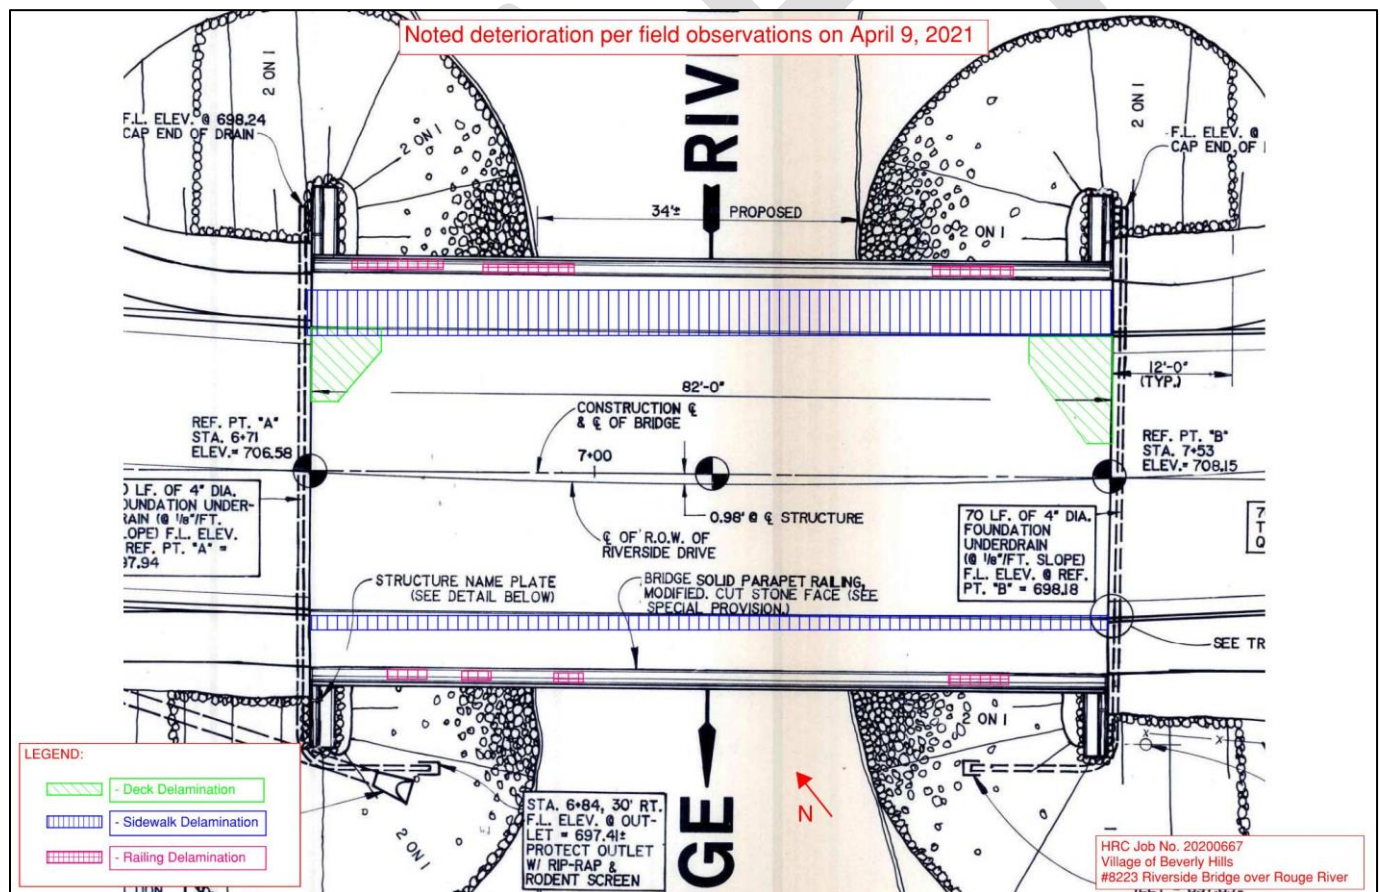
Locations of significant cracking and delamination of the deck, sidewalk and railing.
